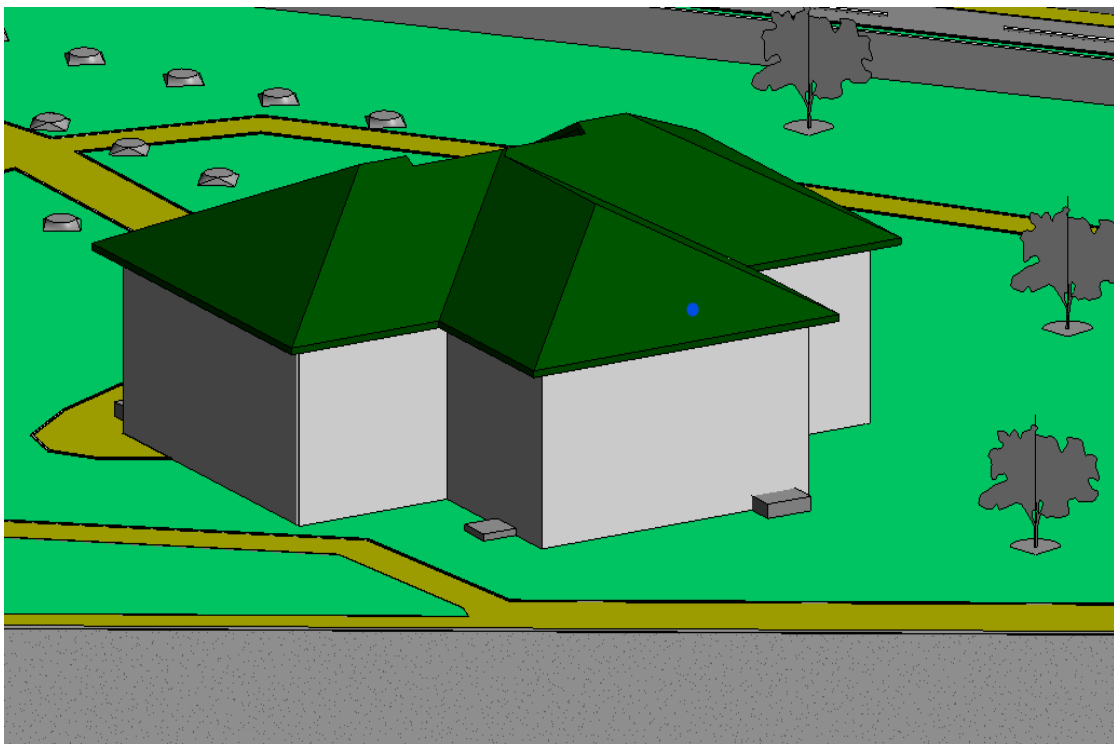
Gruppo CIDIU Building (B1) Revit Model Back View Sensors Placement
